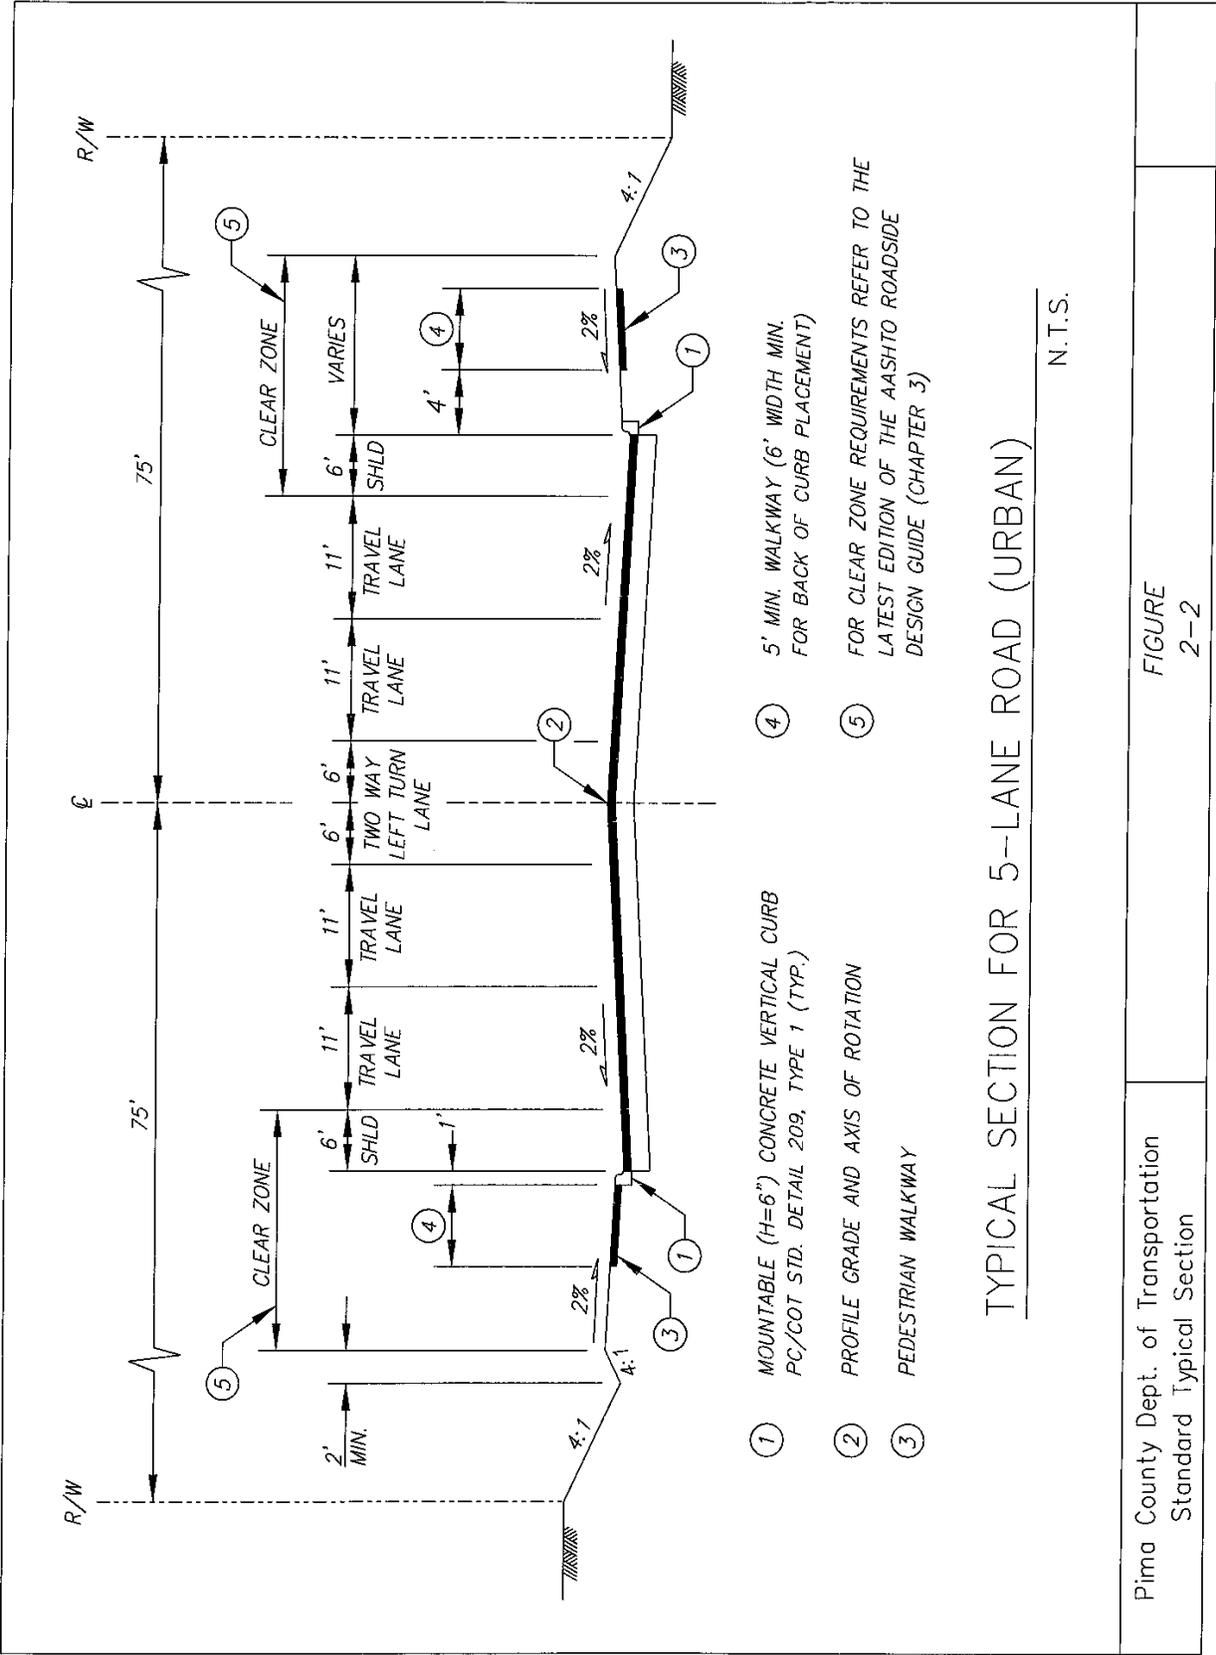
Typical Section for 5 Lane Road (Urban)
